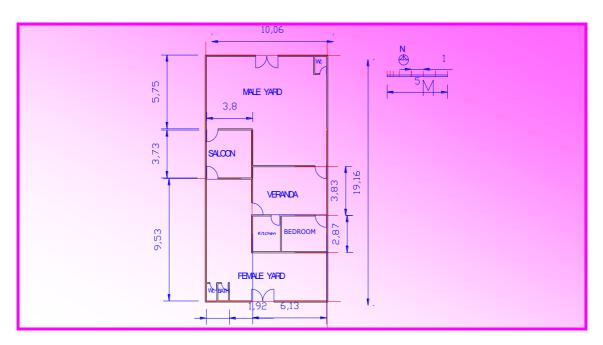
ground floor plan in Mahasin house(Source: Author)
